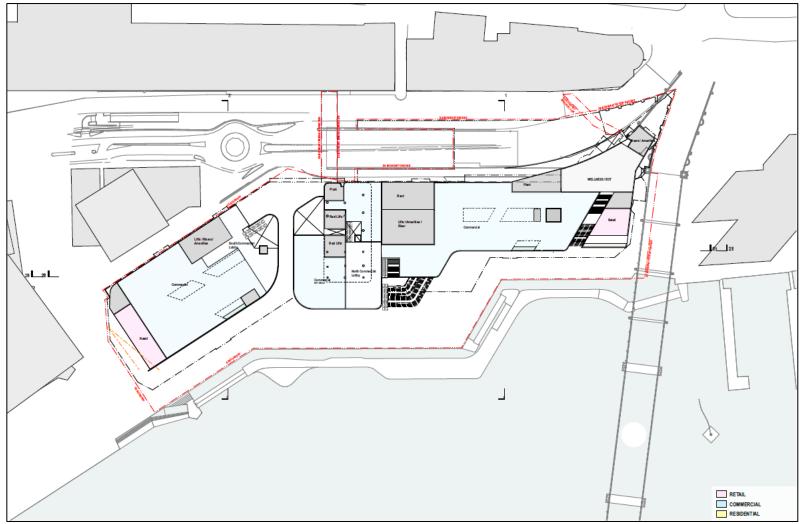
Indicative Plan Only – Level 1 Retail & Commercial (Source: fjmt, 28/09/2020)
